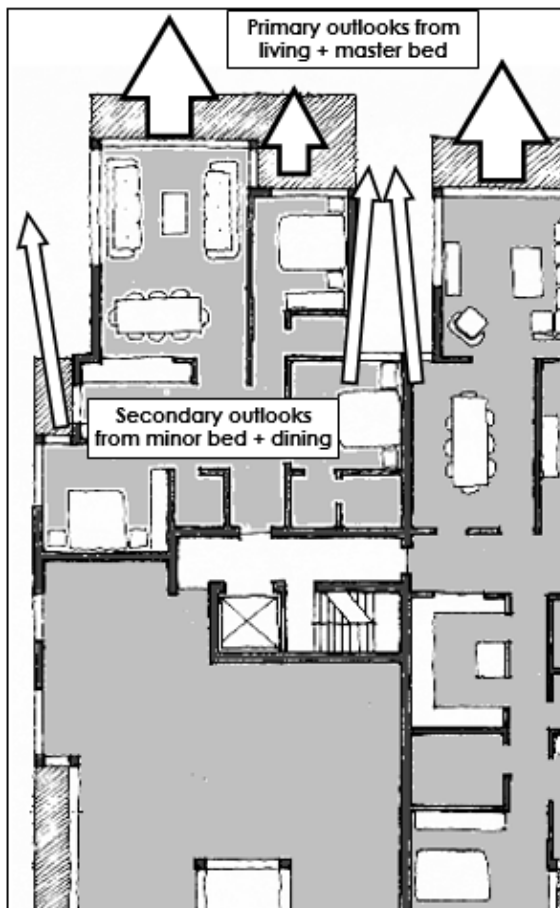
Floorplans provide attractive outlooks. Indicative floorplan facing Terrigal Esplanade
